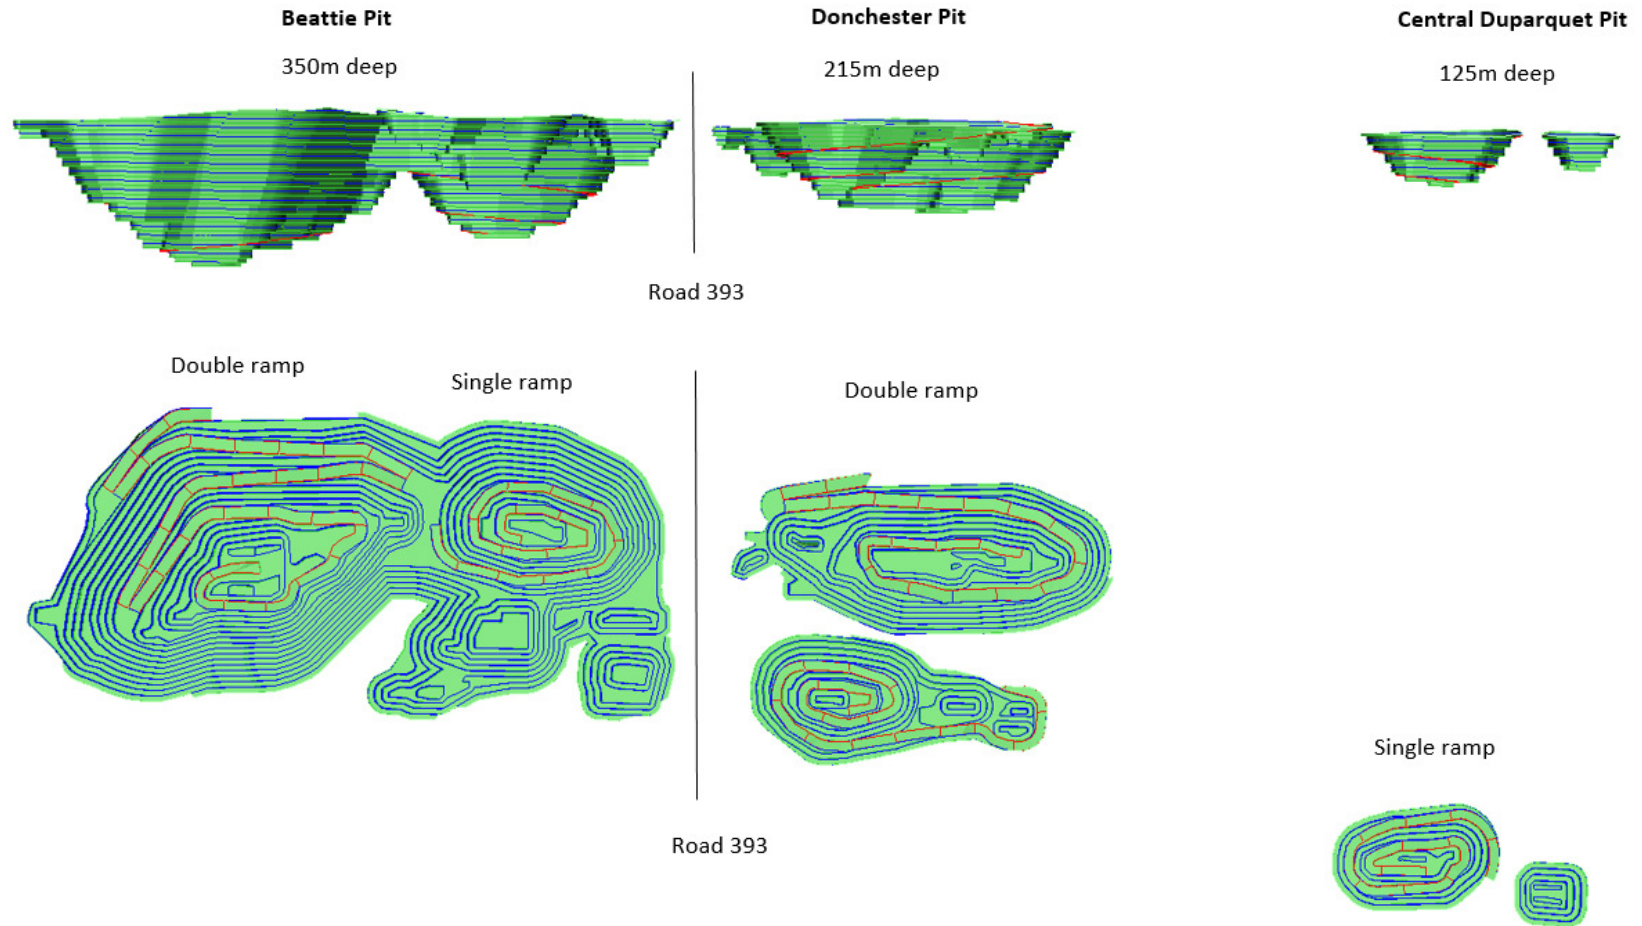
Longitudinal and plan view of the Duparquet Pit
